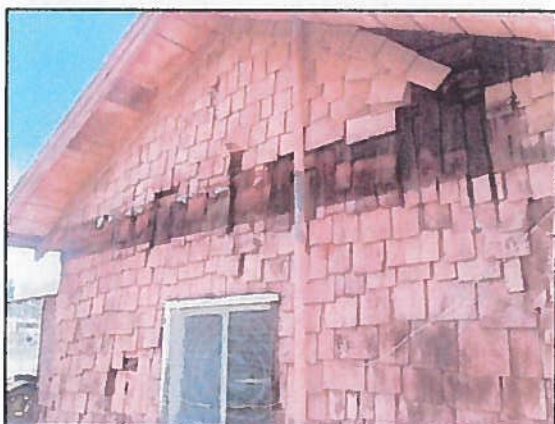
Roy Noon Meeting Hall – Shake siding in poor condition with missing shingles
